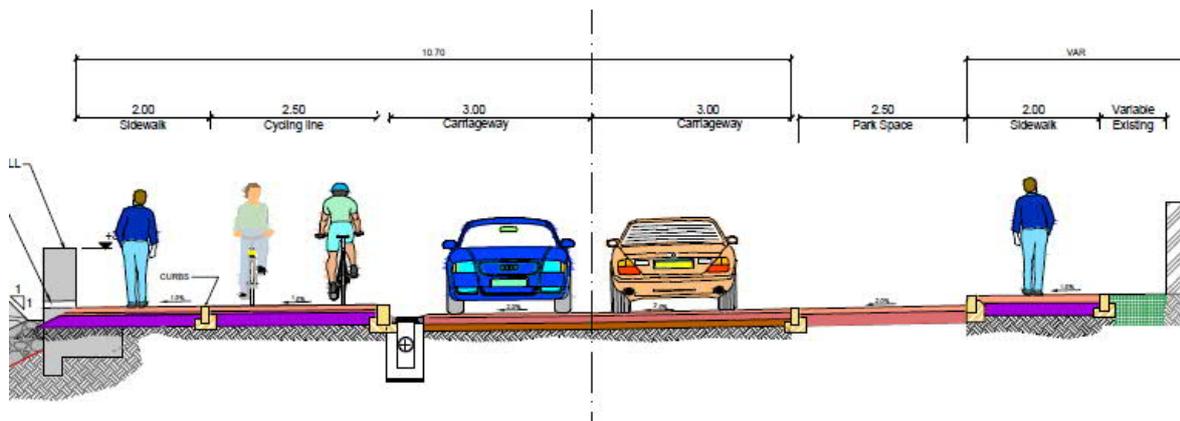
Typical section with parking – Pantufo Coastline, Sao Tomé
